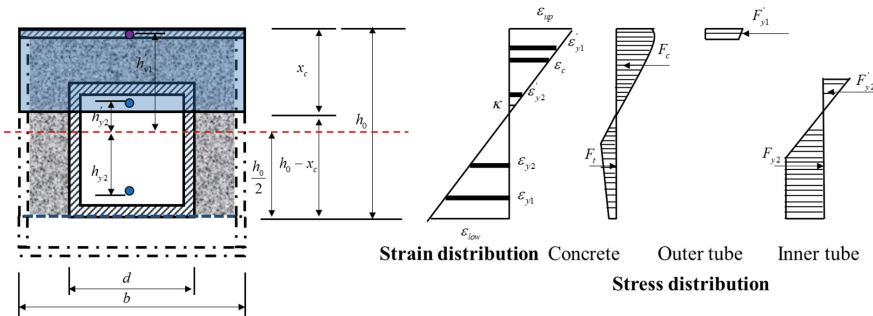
Plane section assumption and force equilibrium of grout connection.
